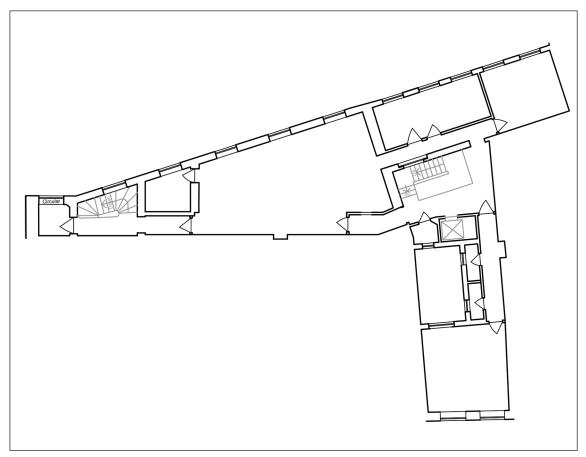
The second-floor plan. [Plan based on the asset management floor plan of the Isle of Wight Council's Corporate and Facilities Management team]
